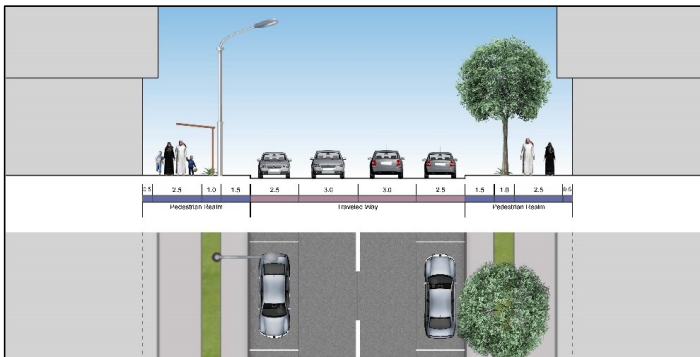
Cross section of Typical city Avenue at Abu Dhabi
